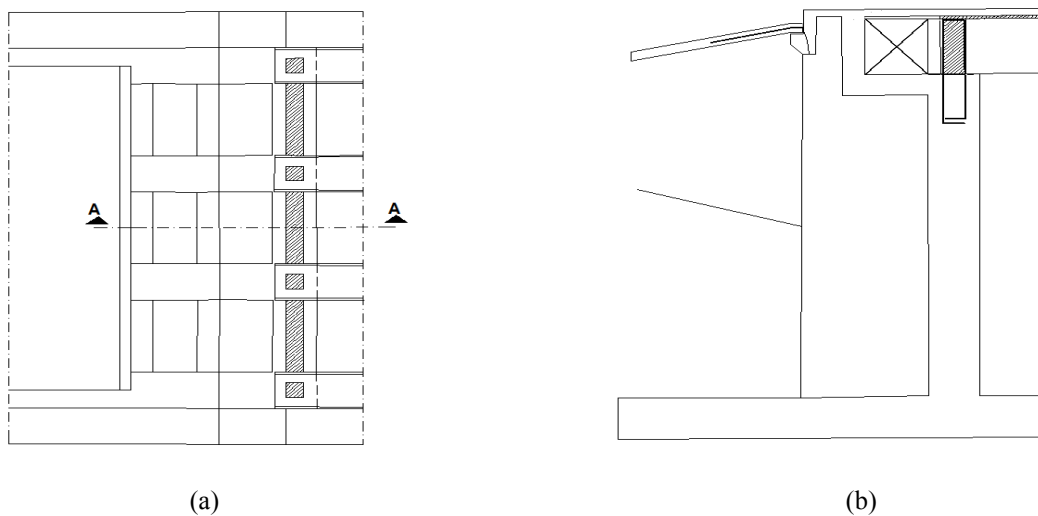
Form of an immovable abutment with two internal struts: (a) Plan view (b) Section A-A.
